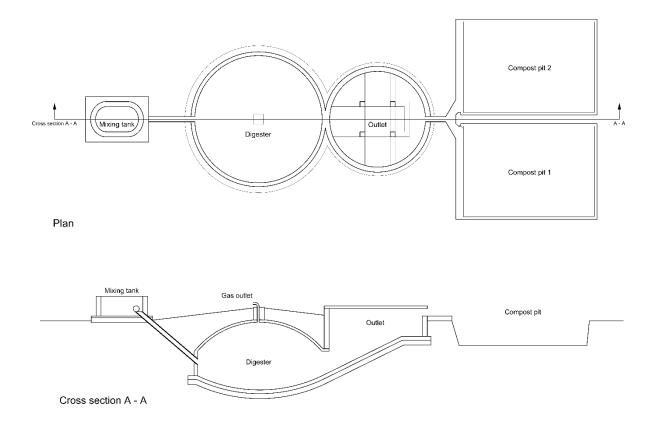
Plan and cross section drawing of the modified GGC fixed dome digester.
